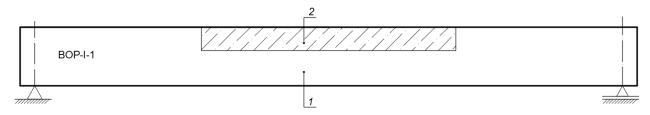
BOP-I beam reinforcement schemes: 1- investigated beam; 2– reinforced concrete insert made of pressed concrete
